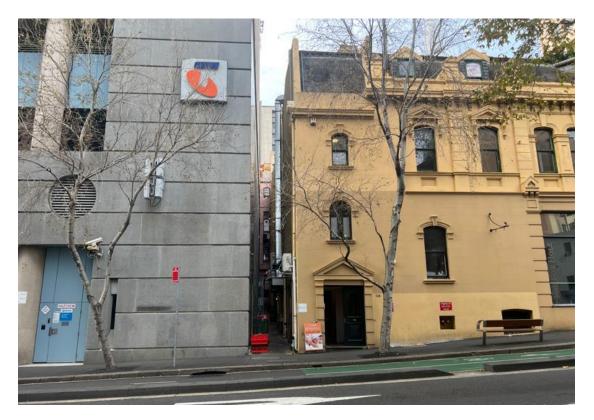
Rear access to the subject site from Kent Street between 97-105 Clarence Street (left) and 68A Erskine Street (right) facing east
